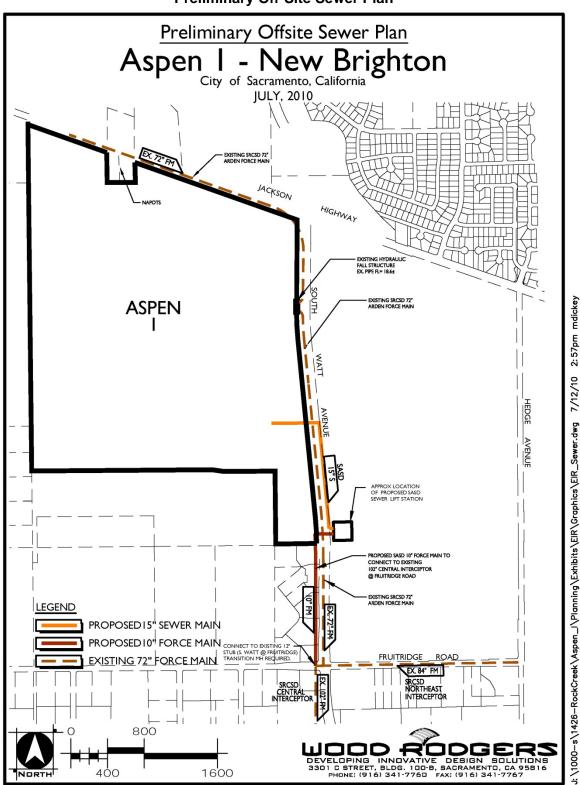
Preliminary Off-Site Sewer Plan
